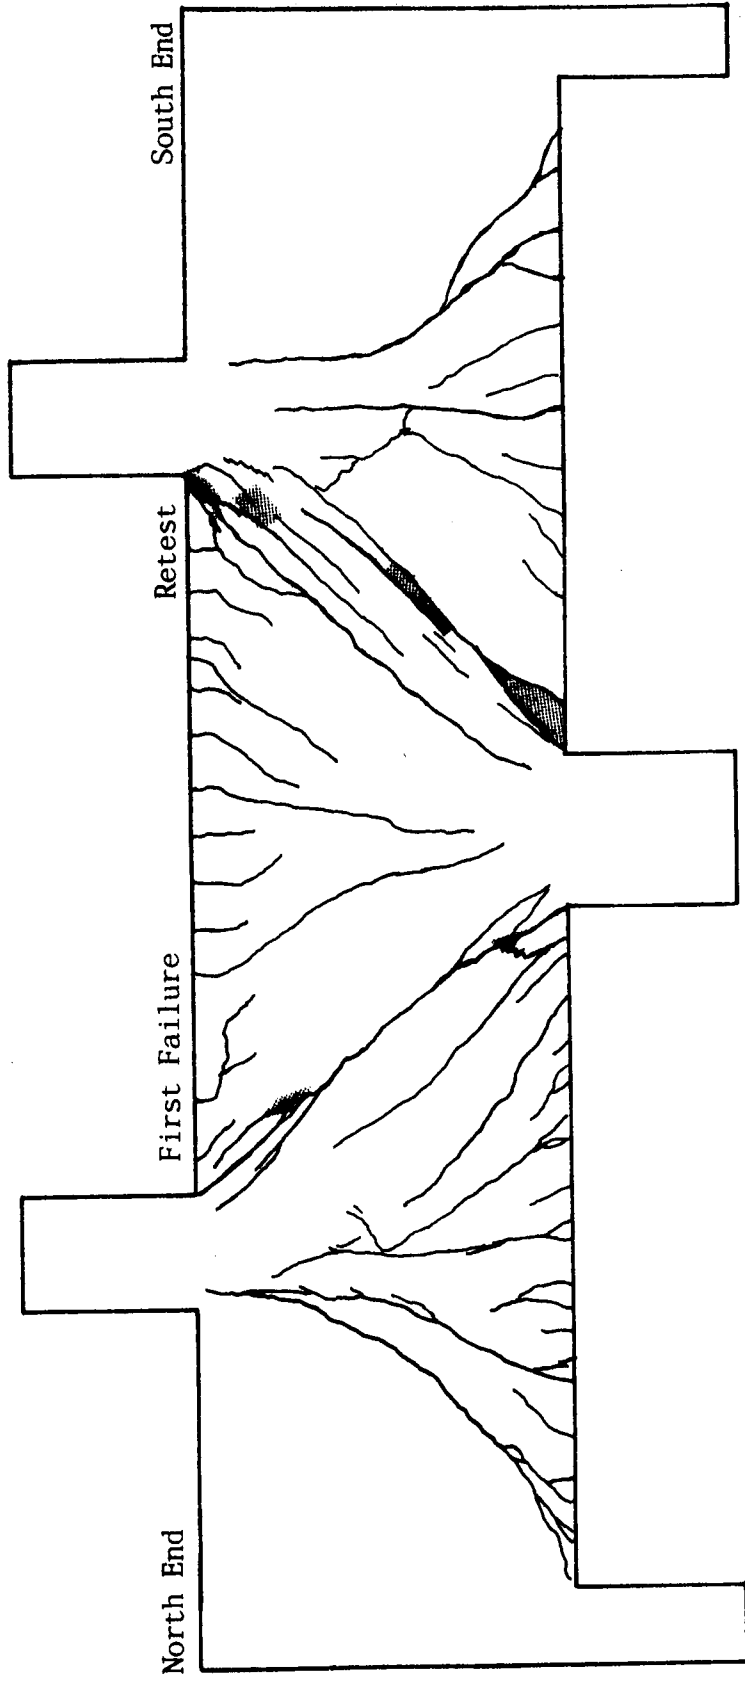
Beam 3/1.0 Crack Pattern - West Face
